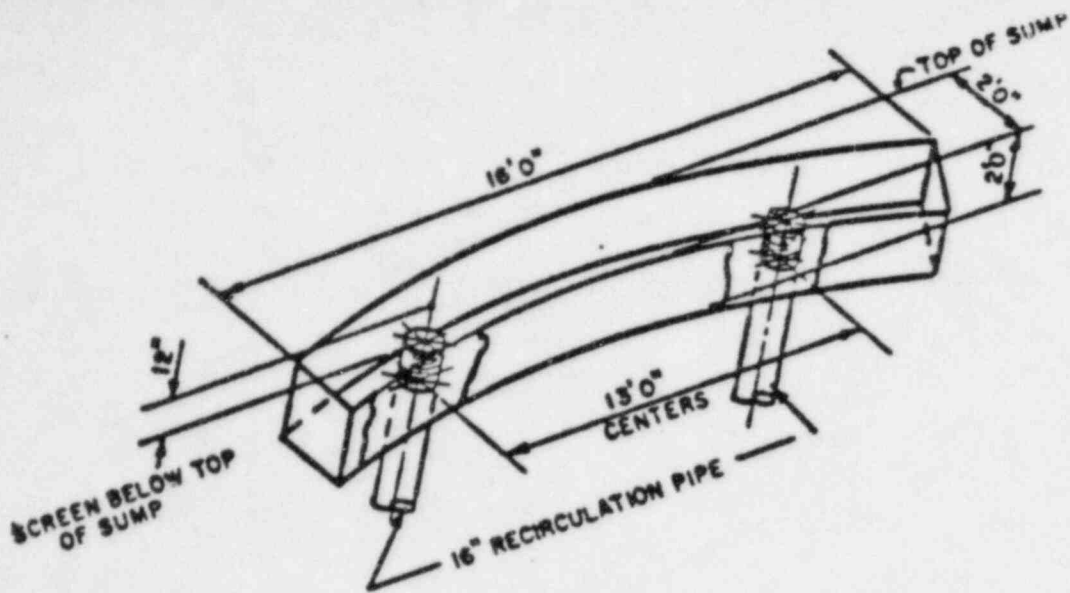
ECCS Sump and Containment Building Layout, Oconee Unit 3
